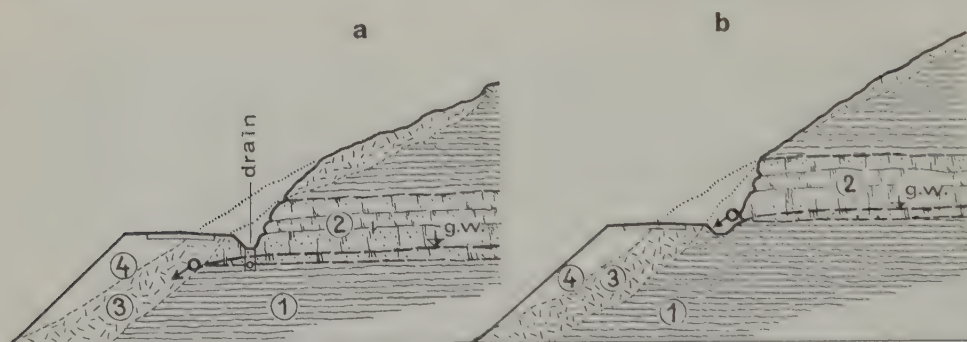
(a) Ground-water flowing out from a sandstone weakens the base of the embankment and must be drained. By lowering the elevation of the road (b), water can be drained by a ditch cut in the impermeable marl; 1 — marl, 2 — sandstone, 3 — slope debris, 4 — fill.
